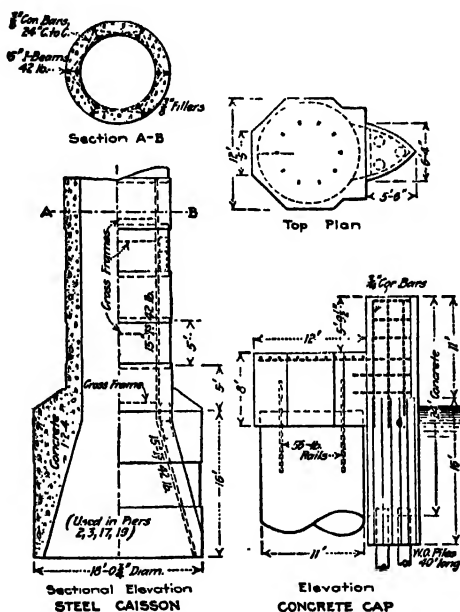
b*.—Double-Wall Metal Cylinder Caisson.
